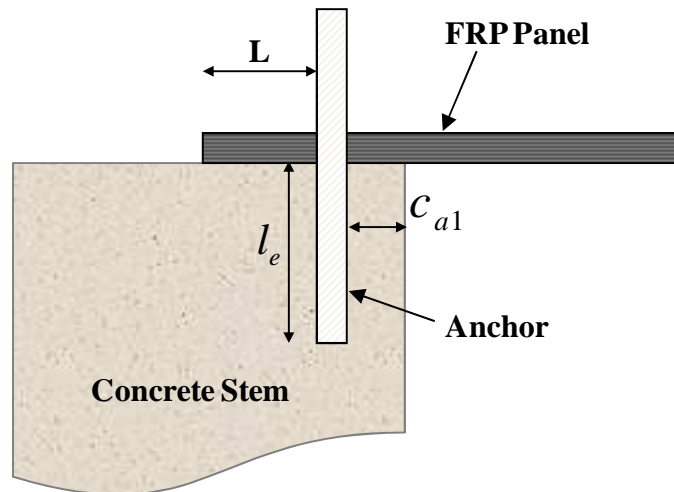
Detail of anchor position with respect to concrete stem and FRP panel
